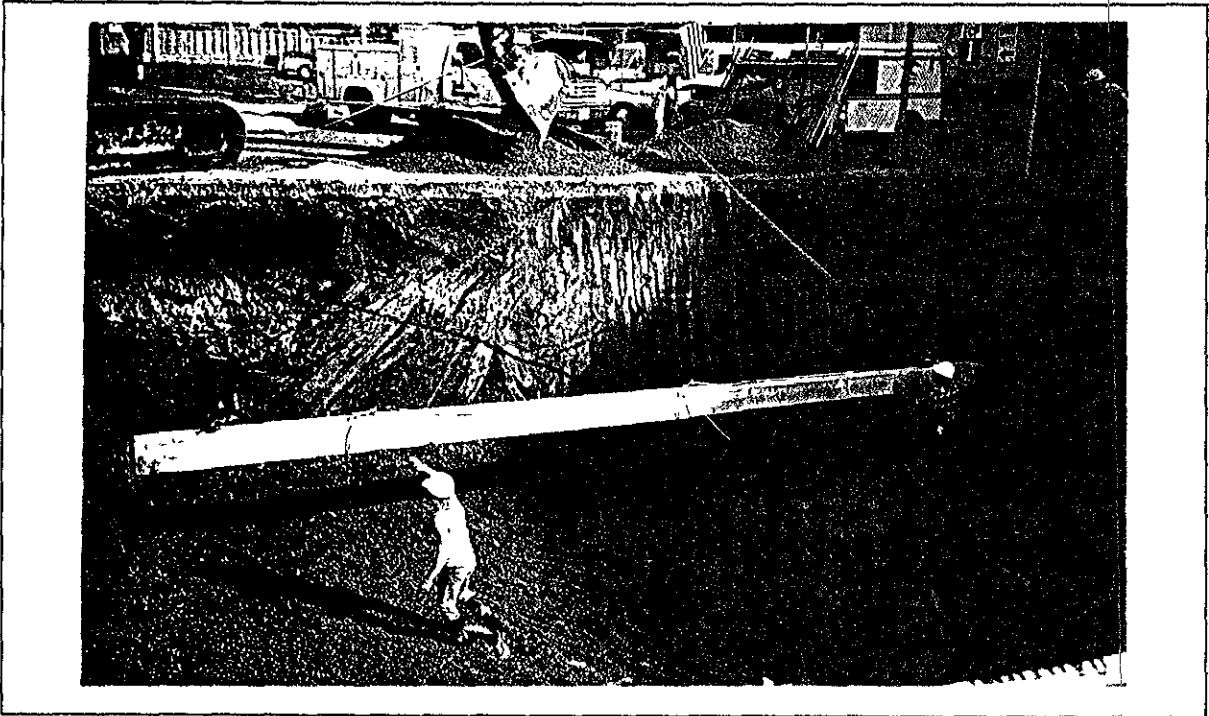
Photo K : Bedding for the new USTs with the first of six deadmen being placed in the excavation.
